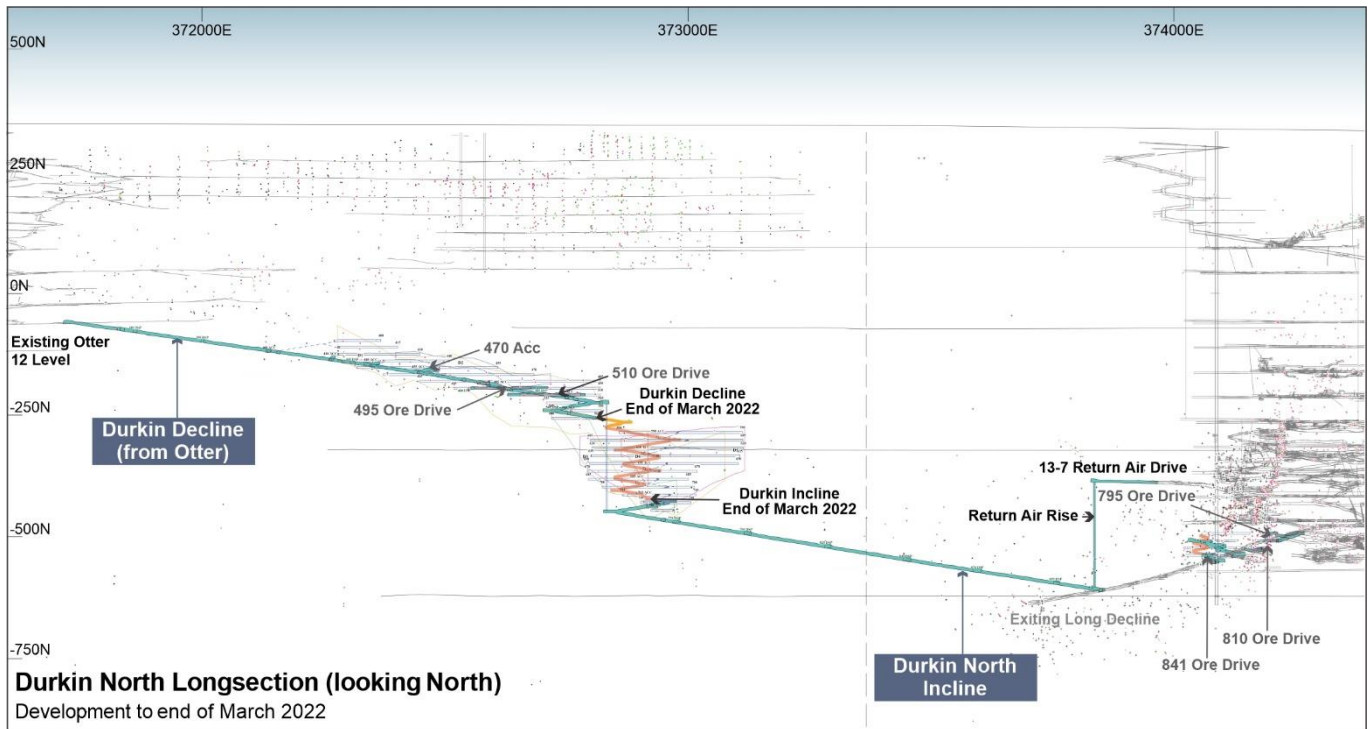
Durkin North Mine Plan Design (Long Section Looking North). Development as at 31 March 2022
